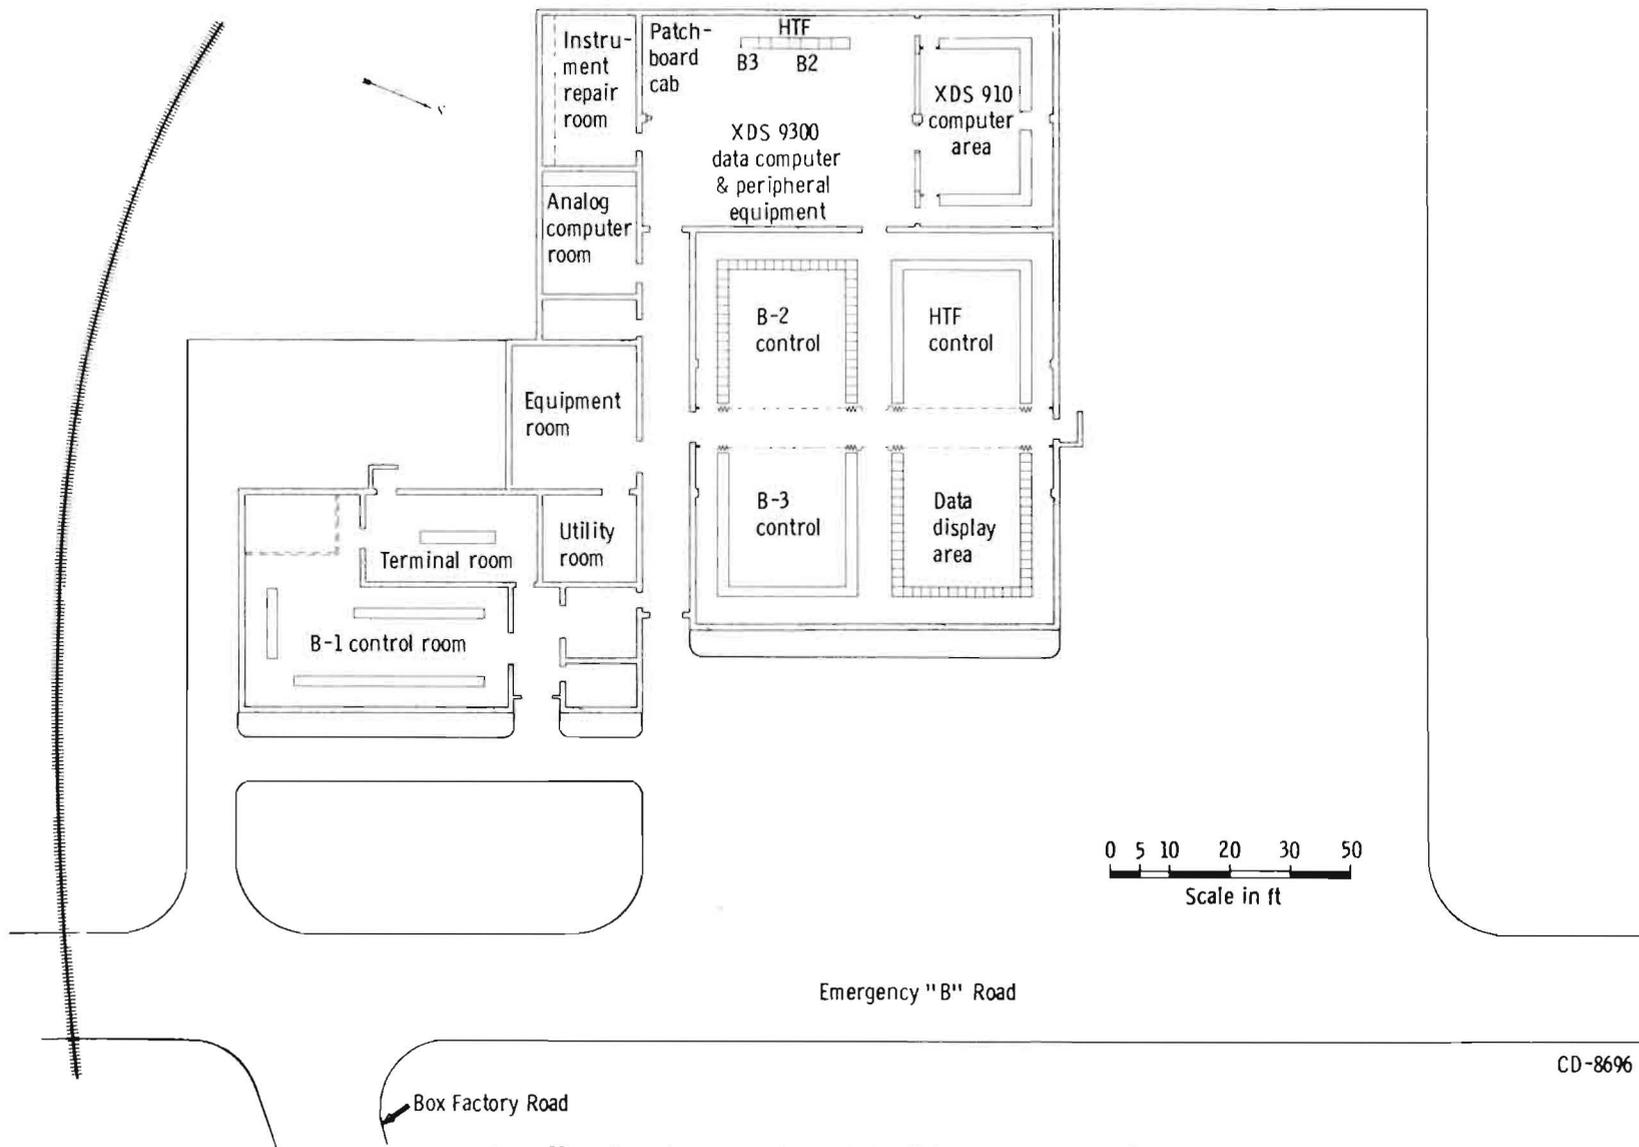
Floor plan, B complex control building, Plum Brook Station.
